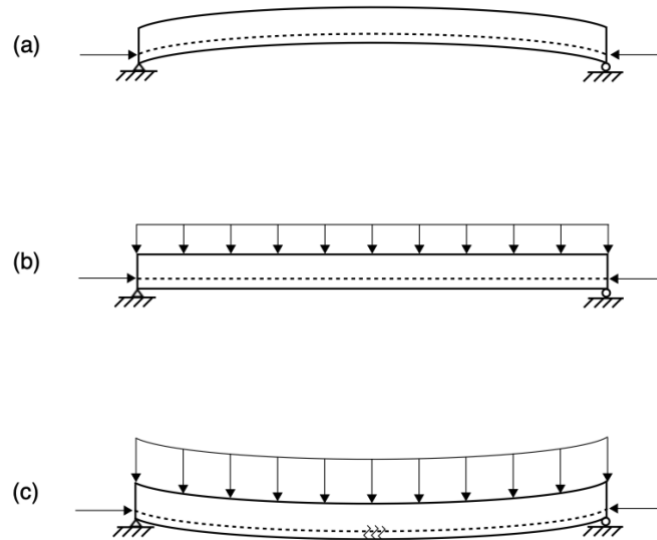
(a) Prestressed member with camber, (b) prestressed member under service loading, (c) prestressed member with loads causing downward deflection
